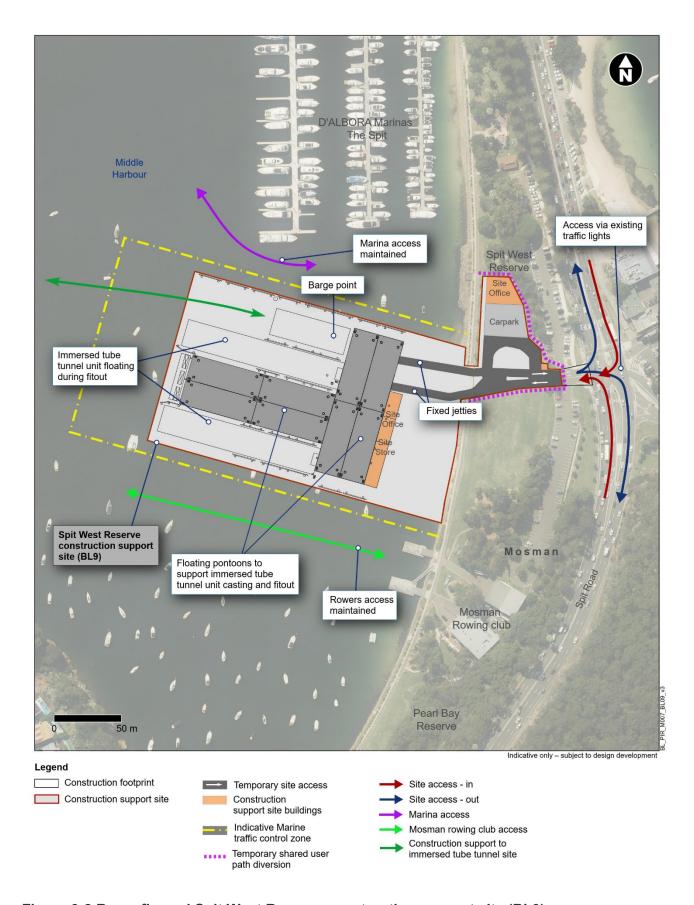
Reconfigured Spit West Reserve construction support site (BL9)
